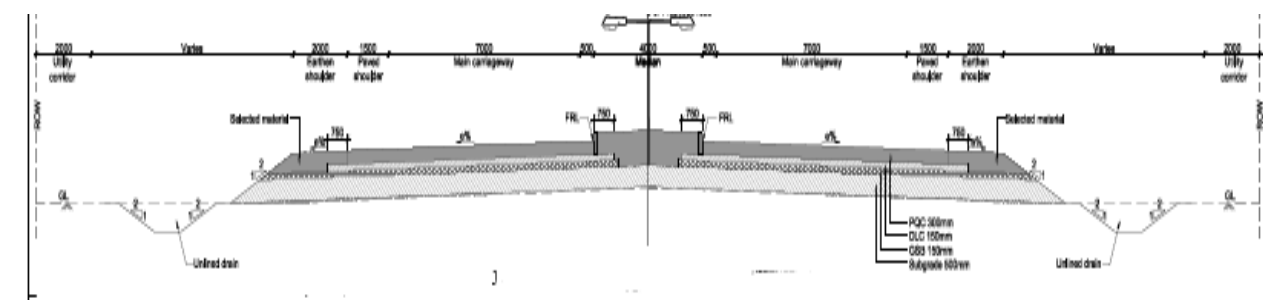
TCS-6 4-lane road for new construction with rigid pavement both side
